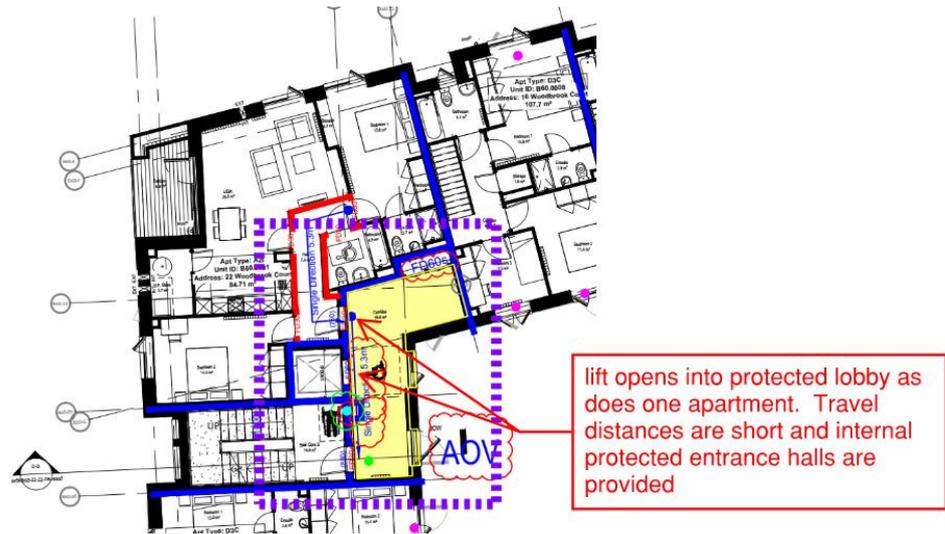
Block 60, first floor plan – lift accessed via vented lift lobby, one apartment and a short travel distance
